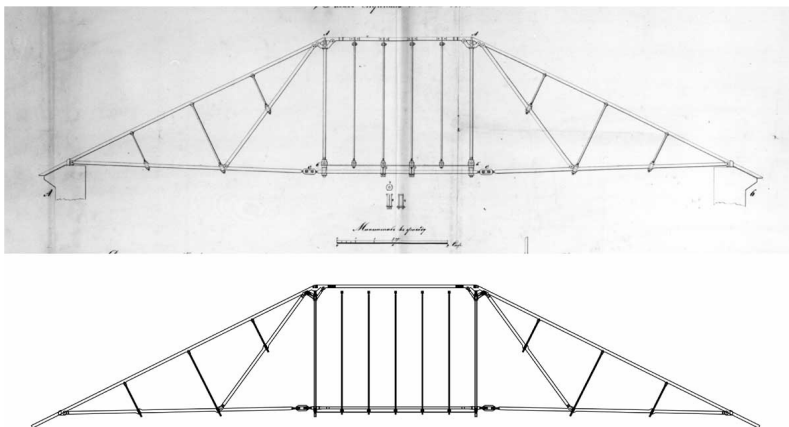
Longitudinal-main-truss of the south-east pavilion: the design and the existing structure (1843 - 2002)
